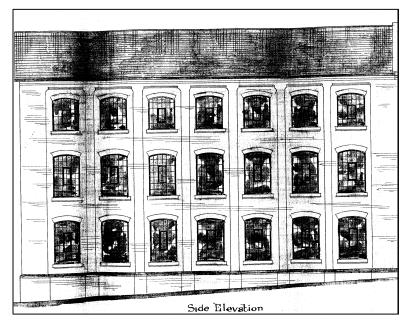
North elevation of Building K1 as planned by Thomas Sutton in  $1888^3$
